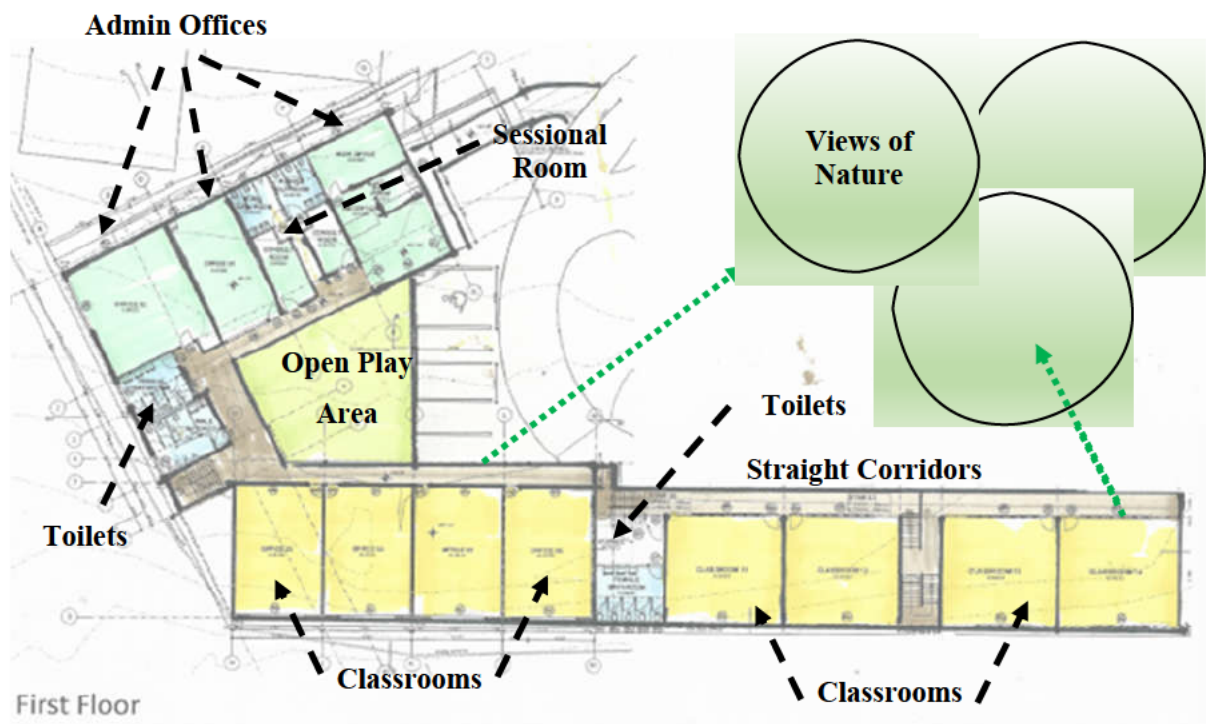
First Floor Plan Layout (Source: Author2023)
